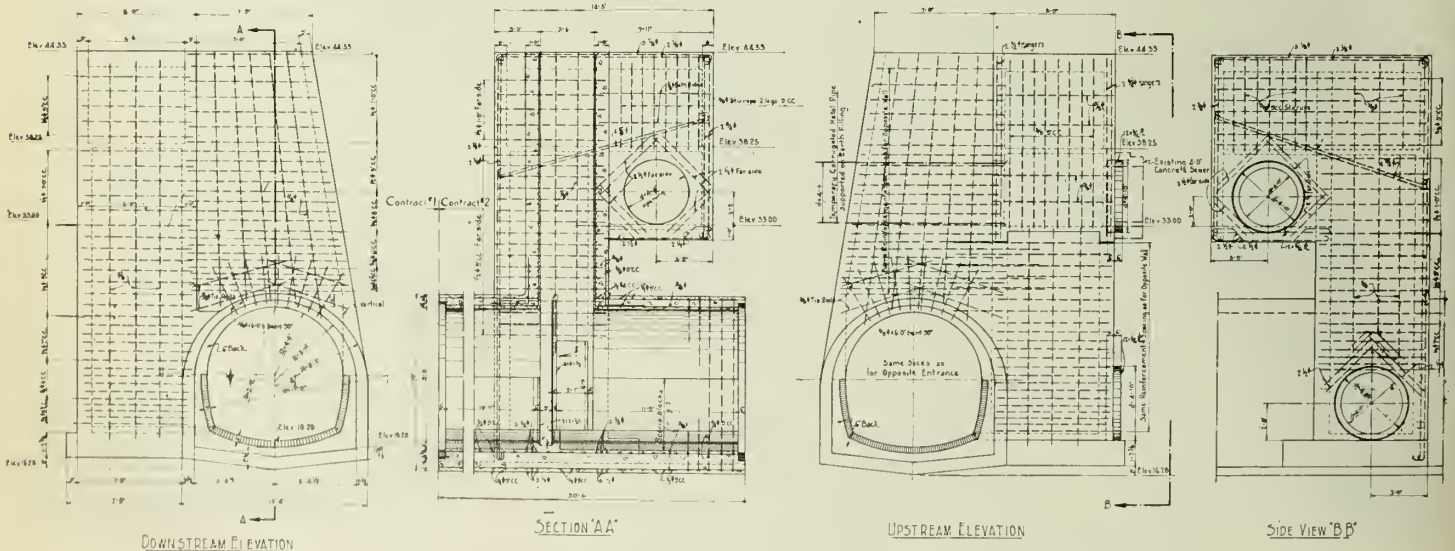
Detail Plan of Chamber Connecting with Syphon under Aqueduct Canal.
